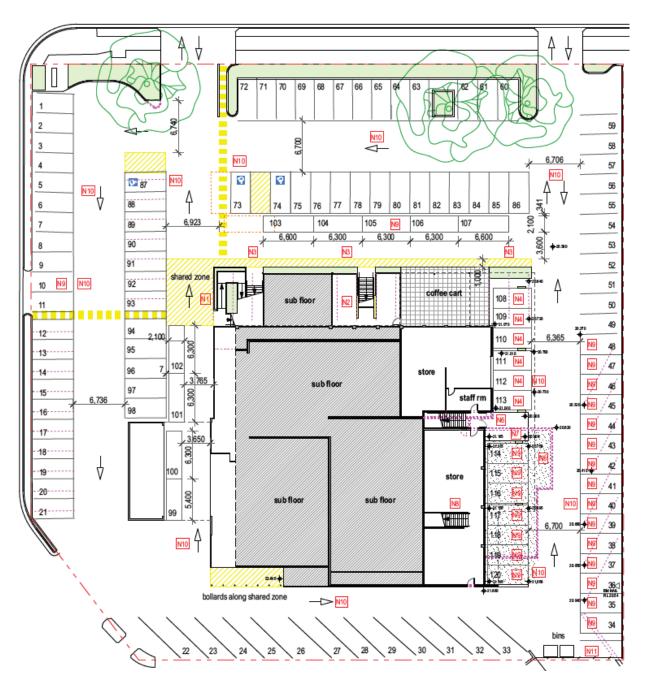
Site plan and basement of the Tavern for works approved under DA/2020/520 (Source: Darren Mah Design; dated 14 August 2020)
